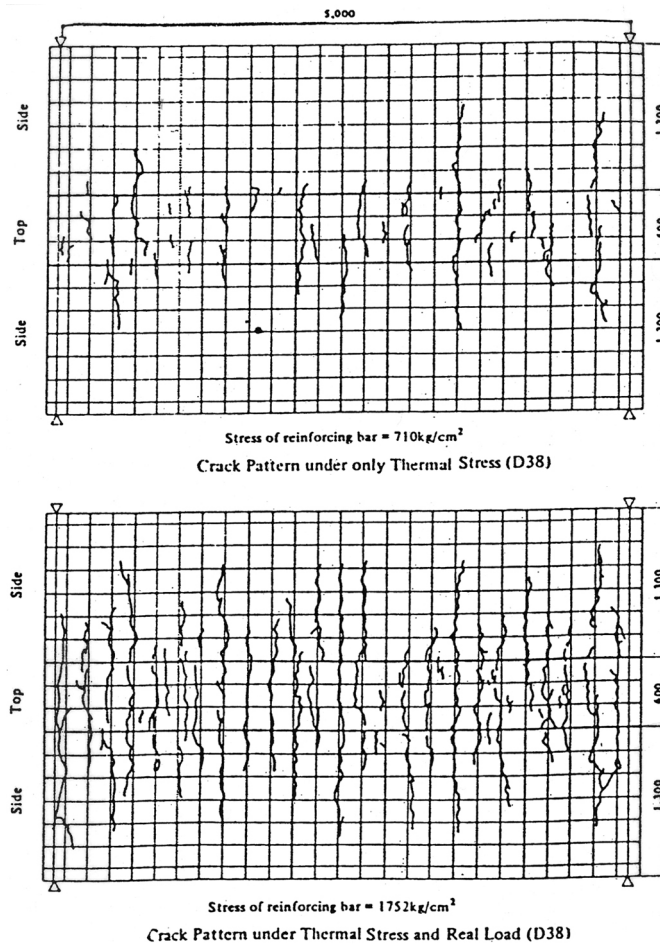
Crack patterns for specimen D38 (Table 11) due to thermal stress only and thermal stress with loading. Source: N. Shibasaki et al., "Thermal Cracking and Thermal Stress Relaxation of Reinforced Concrete Member Tested by Full Sized Beam Specimens," Paper J4/2, Vol. J, *Trans. of 7th Intl. Conf. on St. Mech. in Reactor Technology*, p. 179–187, Chicago, Illinois, August 22–26, 1983.
